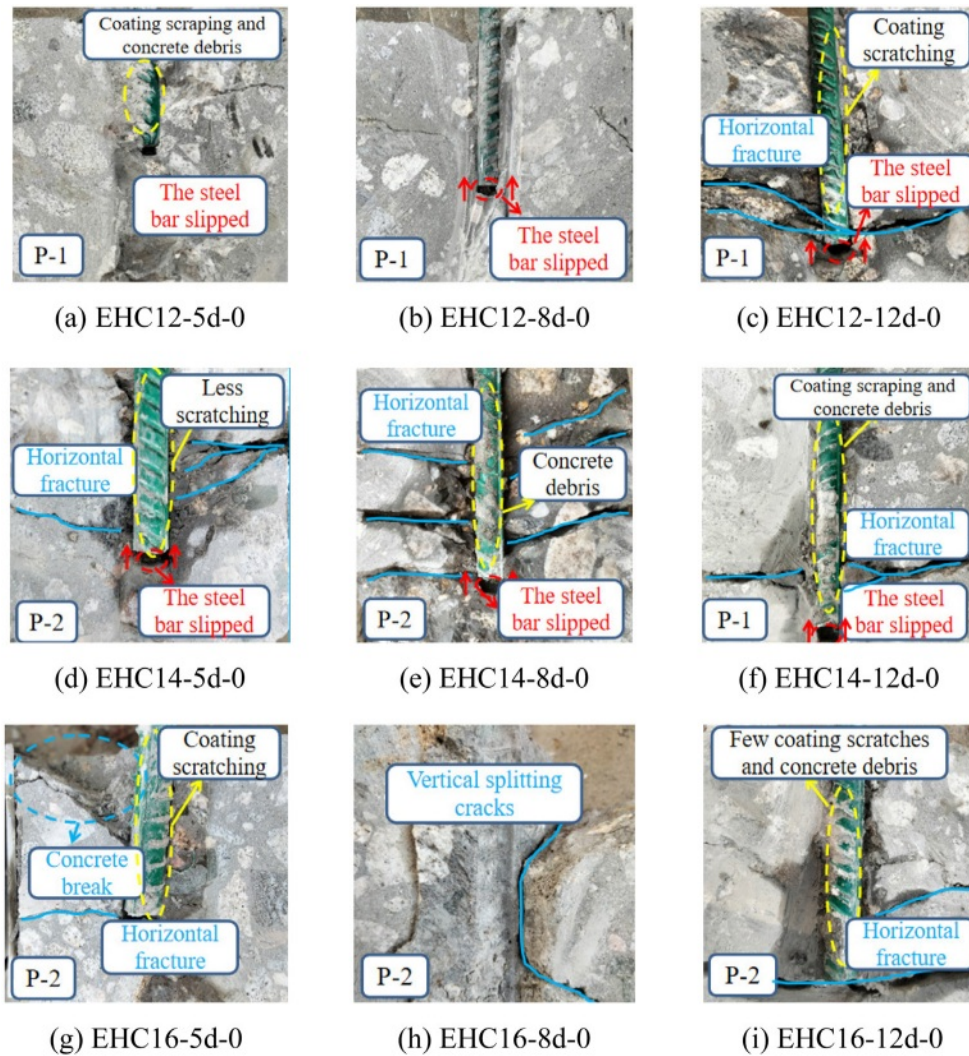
Failure pattern of rebar specimens without bending angles.
